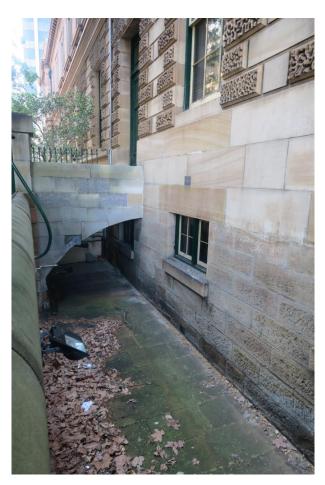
Bridge Street entrance sandstone bridge (reconstructed)
